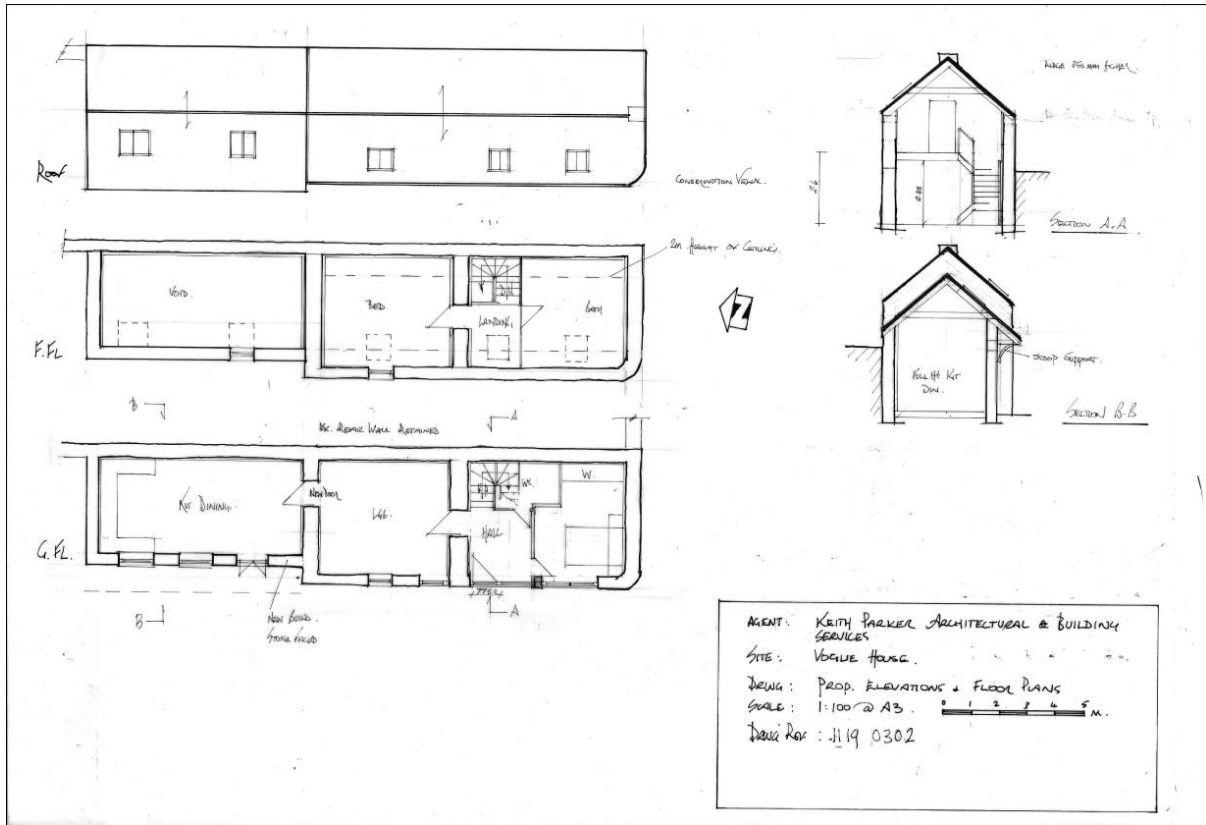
THE PROPOSED PLANS FOR THE SITE (SUPPLIED DRAWINGS).
